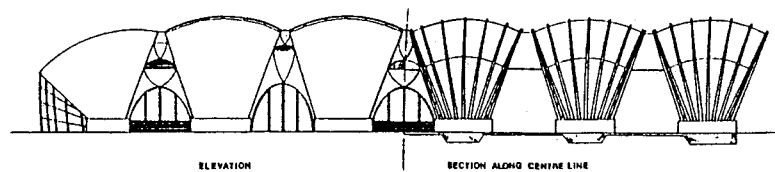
Structural details of the Woodland School of Industry at Hooke Park.
